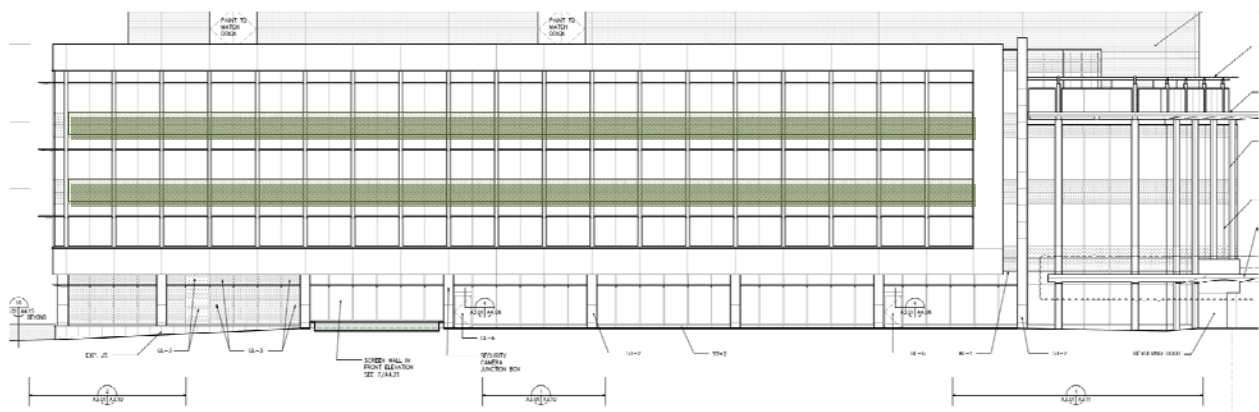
South Elevation (A3.01 elevation 1) provided by the Drawings by Zimmer Gunsul Frasca Architects.
